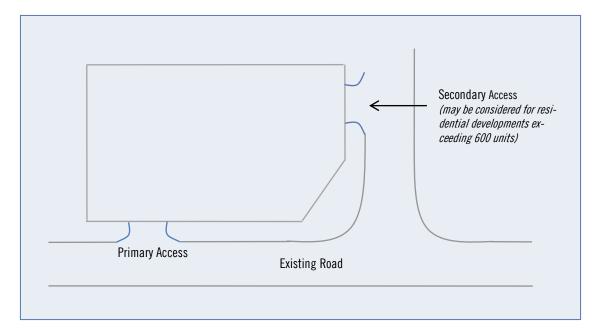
Access Arrangement for Residential Developments Exceeding 600 Units - additional ingress/egress could be considered from another road fronting the development site
